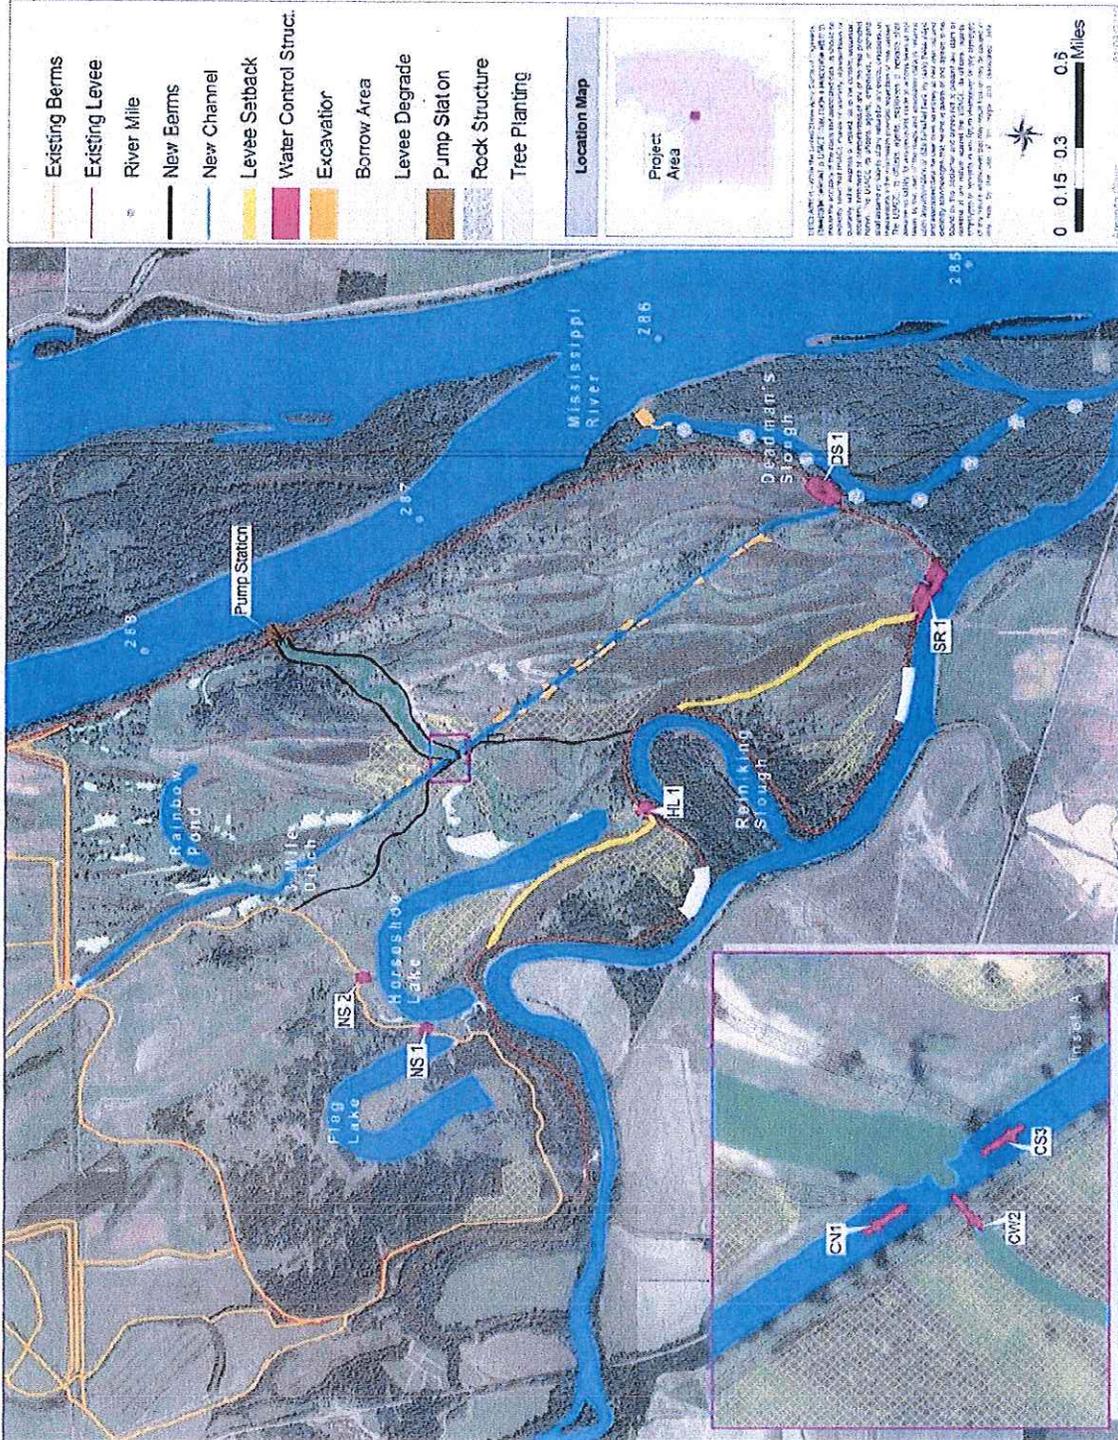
Recommended Plan for Ted Shanks Conservation Area HREP
